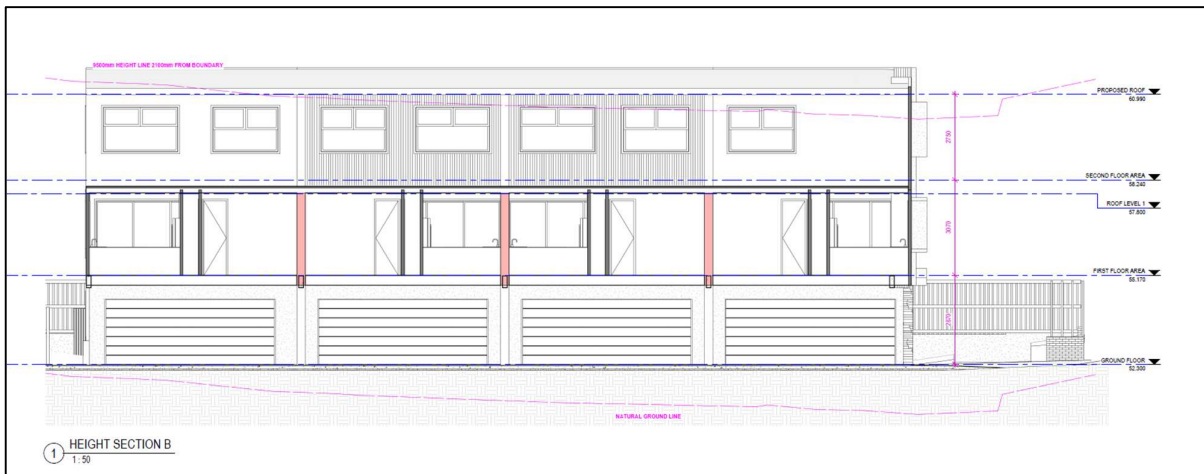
Building Height Section (Tarun Jangra Building Designers,2026)
